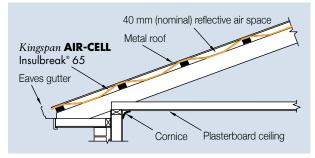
Side elevation of *Kingspan* AIR-CELL Insulbreak® 65 in a metal roof with a flat ceiling
